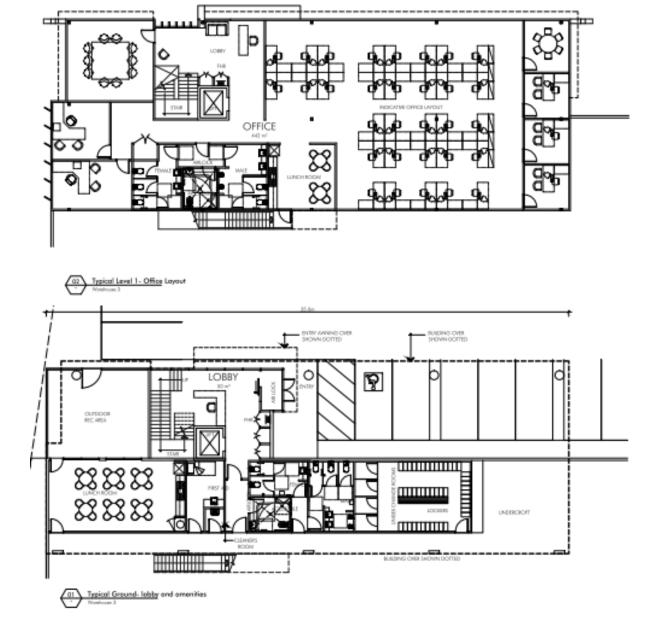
Warehouse 2 - office floor plans on Ground Floor and Level 1
